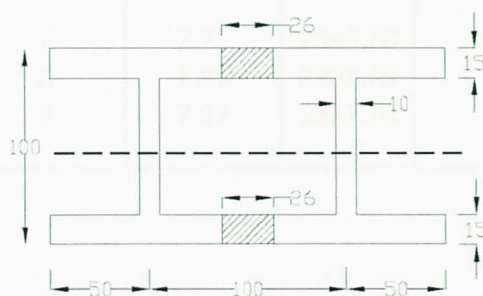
Cross section of 975mm x 200mm x 100mm plate girder
